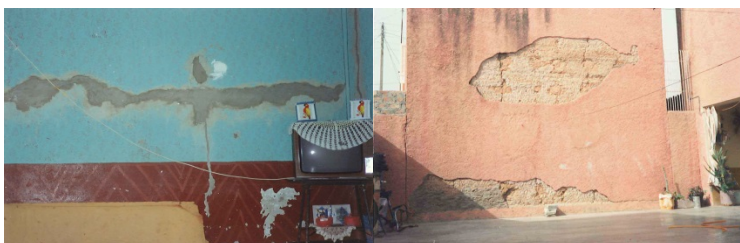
A repaired horizontal crack in the middle of inside face of the external rammed earth wall in a house in Mostefa Ben Brahim. Note the repaired vertical crack on the right-hand side wall.
